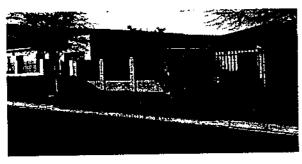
IMAGE SHOWING GARAGE PARAPET/ BOUNDARY WALL FROM NEIGHBOR'S VIEW POINT
